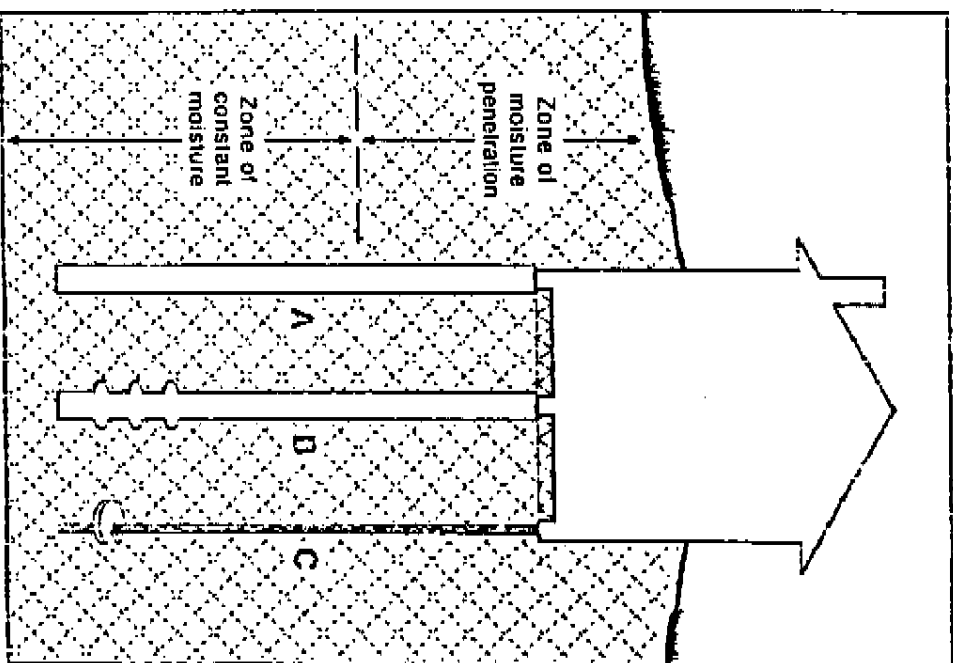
Drilled pier foundation. (Modified from Holtz and Hart, 1978.)
